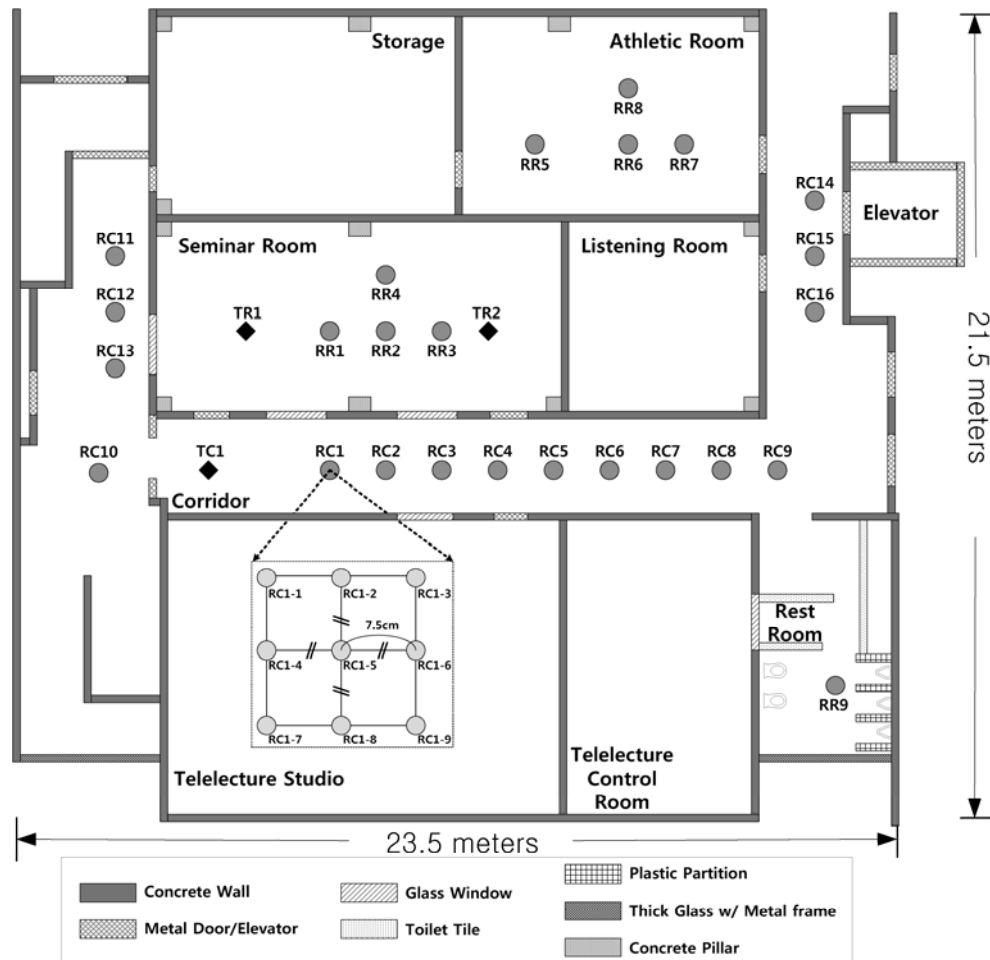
Layouts of the measurement site, the basement of laboratory building.
